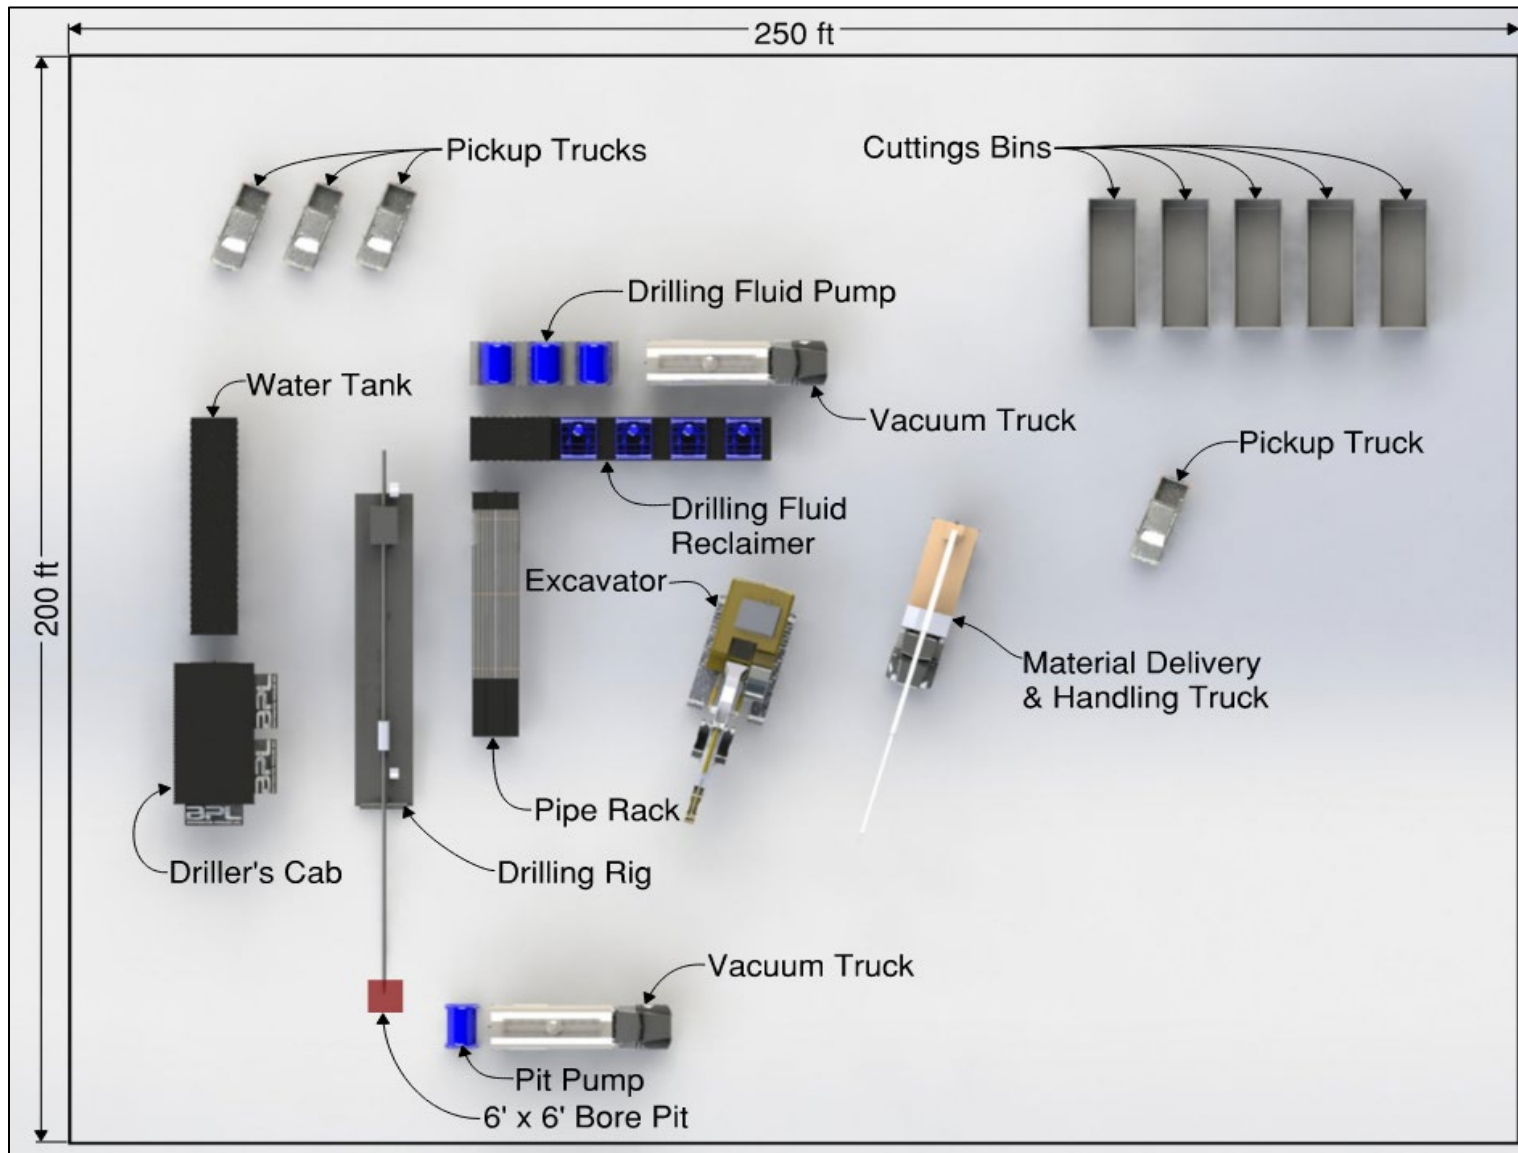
Conceptual HDD Worksite Layout: East Work Area
